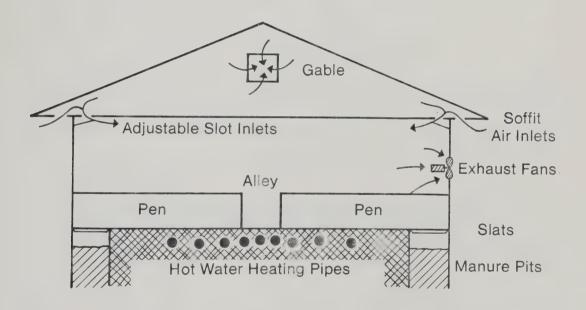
An end-view schematic of barn SL-1 showing some ventilation and structural details.
